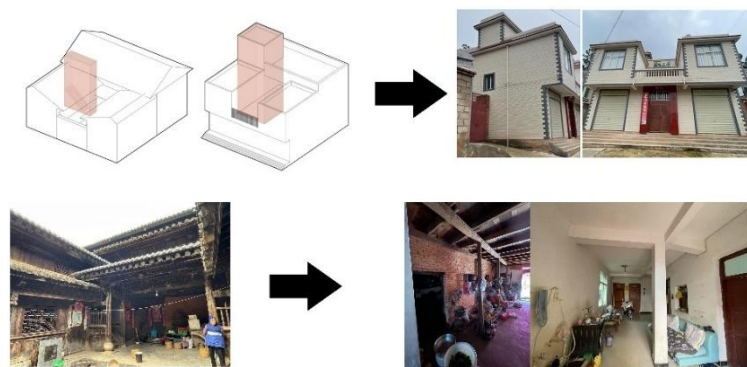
Staircase Location and Window Opening Toward the “Courtyard”
